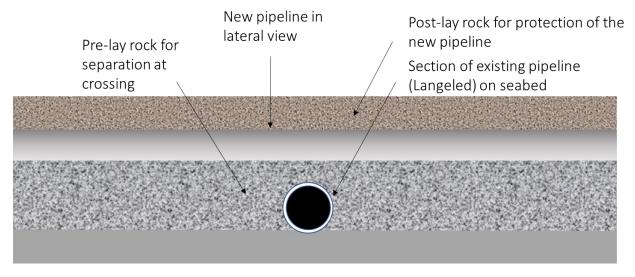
Typical crossing of surface infrastructure (Langeled pipeline)
